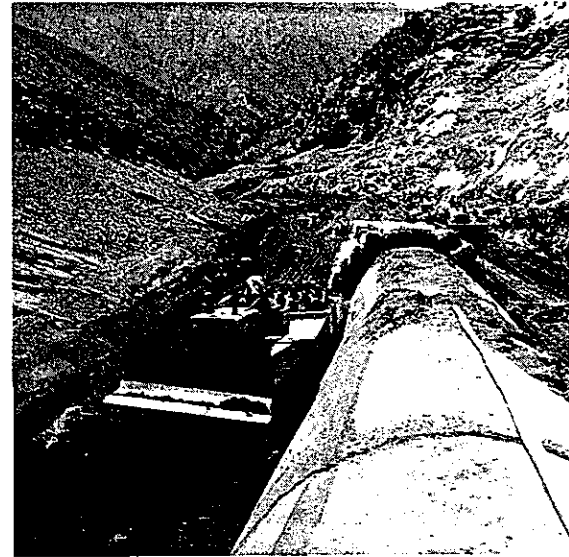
Backfilling operations Posey Canyon Arch Culvert.
